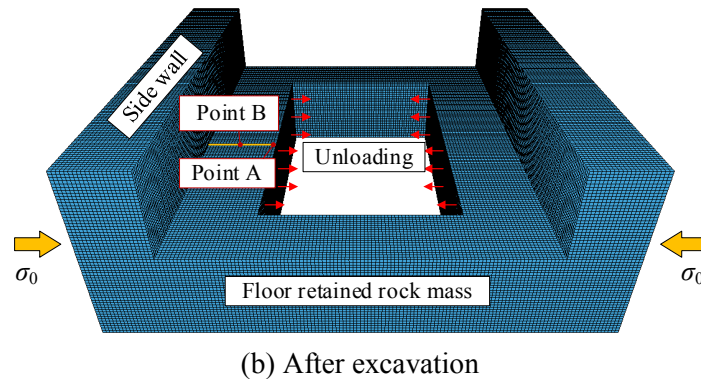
Unloading calculation model for excavation of floor of underground powerhouse of hydropower station
